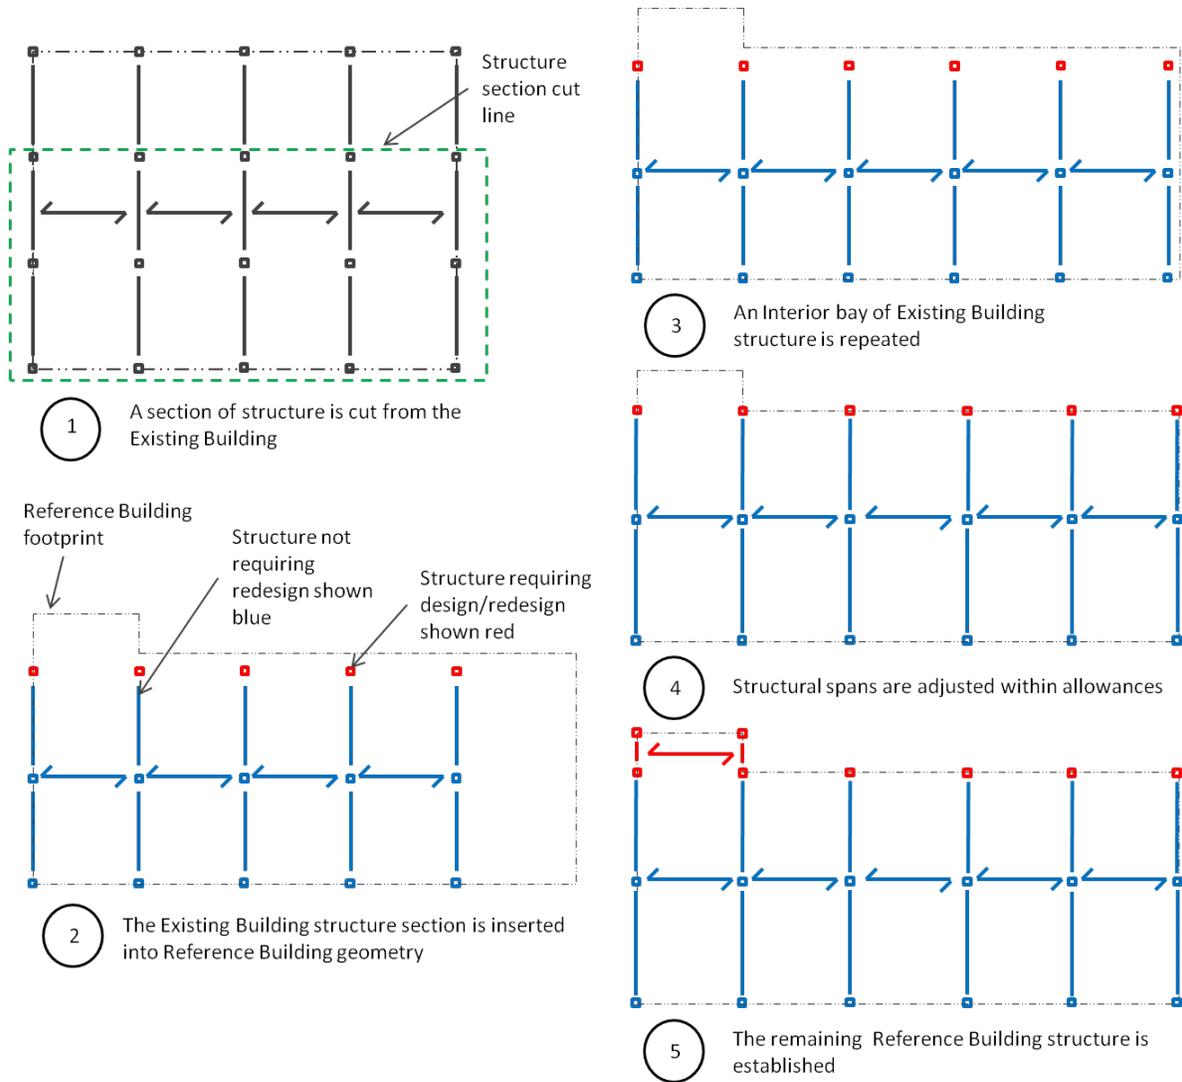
Use of an Existing Building for the Reference Building Structure, option 2 (plan view)
